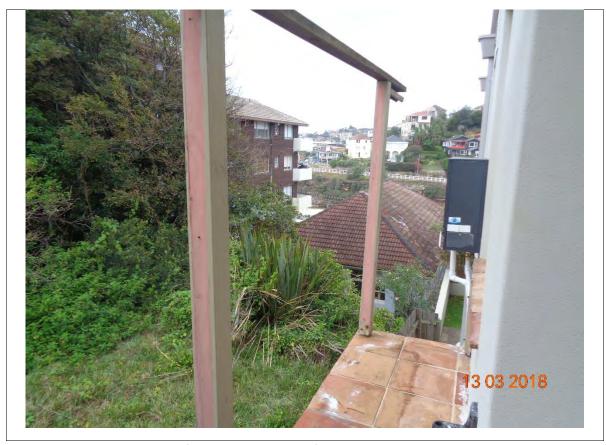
Subject site viewed from side boundary of 12 Silva Street
